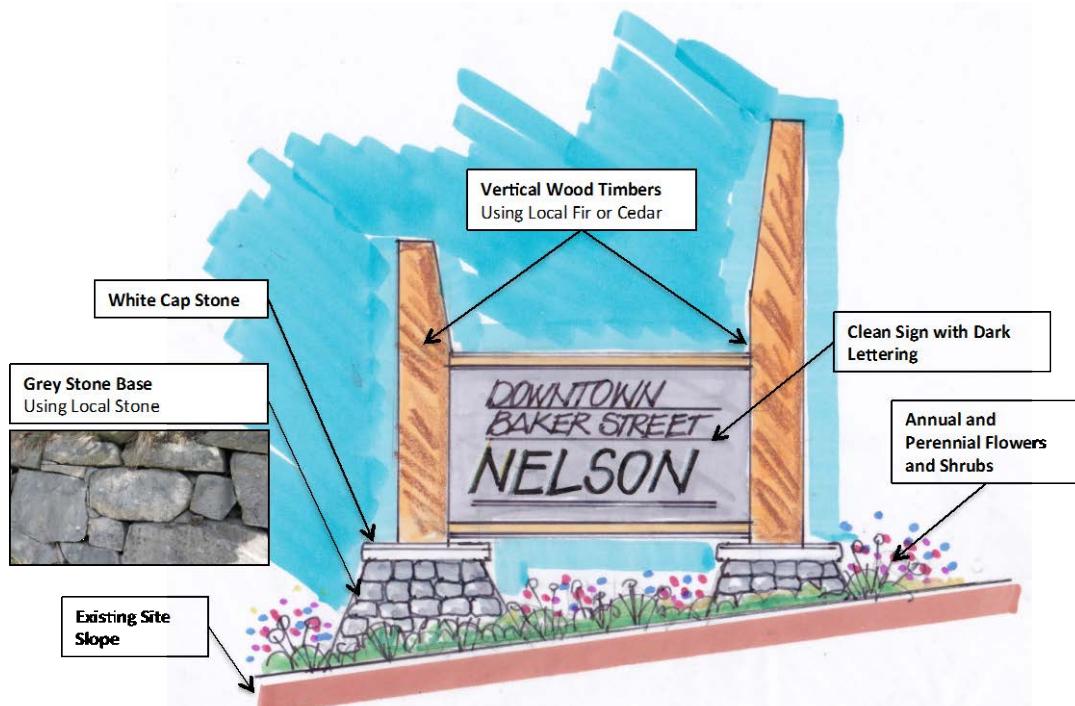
Primary west gateway sign at Baker Street and Highway 3A
